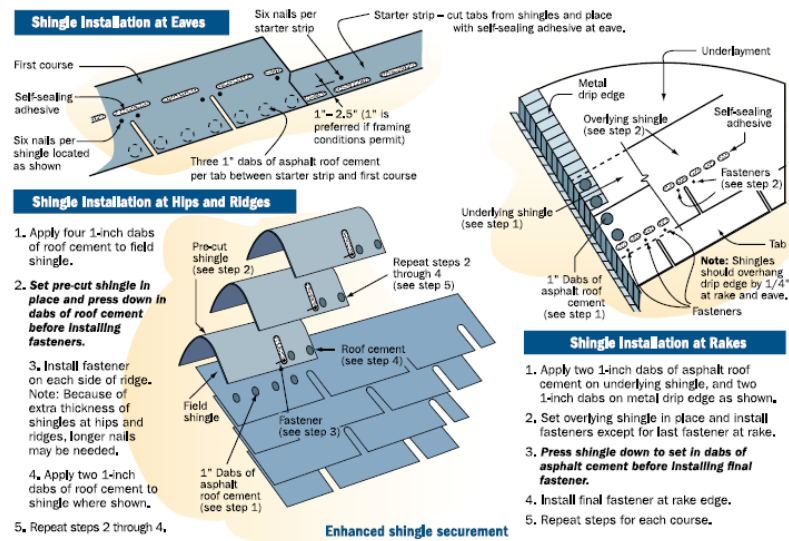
shingle installation procedures (FEMA (2010) Technical Sheet No.7.3)
